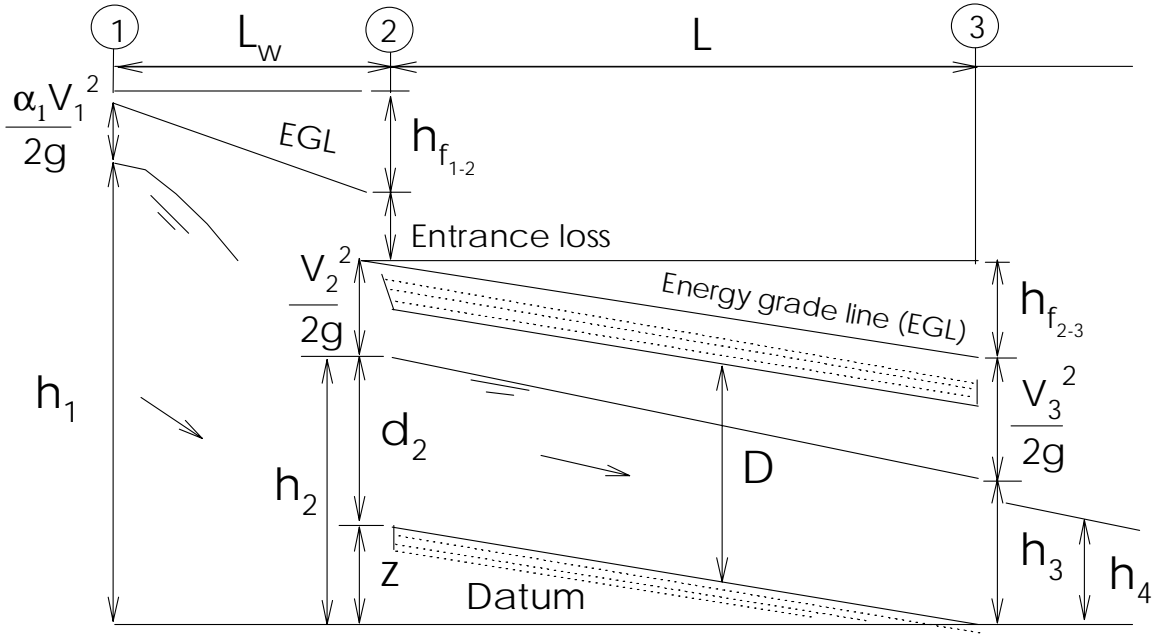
Definition sketch for a stream reach with flow through a culvert. 1 is at the approach section, 2 is at the culvert inlet section, and 3 is at the culvert outlet section. L_w is the reach length between sections 1 and 2; L is the culvert barrel length; D is the culvert barrel height; d_2 is the flow depth in the culvert inlet and z is the fall over the culvert length. h is the water-surface elevation and V is the mean velocity in the section denoted by the numeric subscript. h_f is friction loss over L_w for subscript 1-2 and over L for subscript 2-3.
